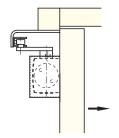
Parallel arm application Closer is fixed to the push side of the door using fixing bracket
